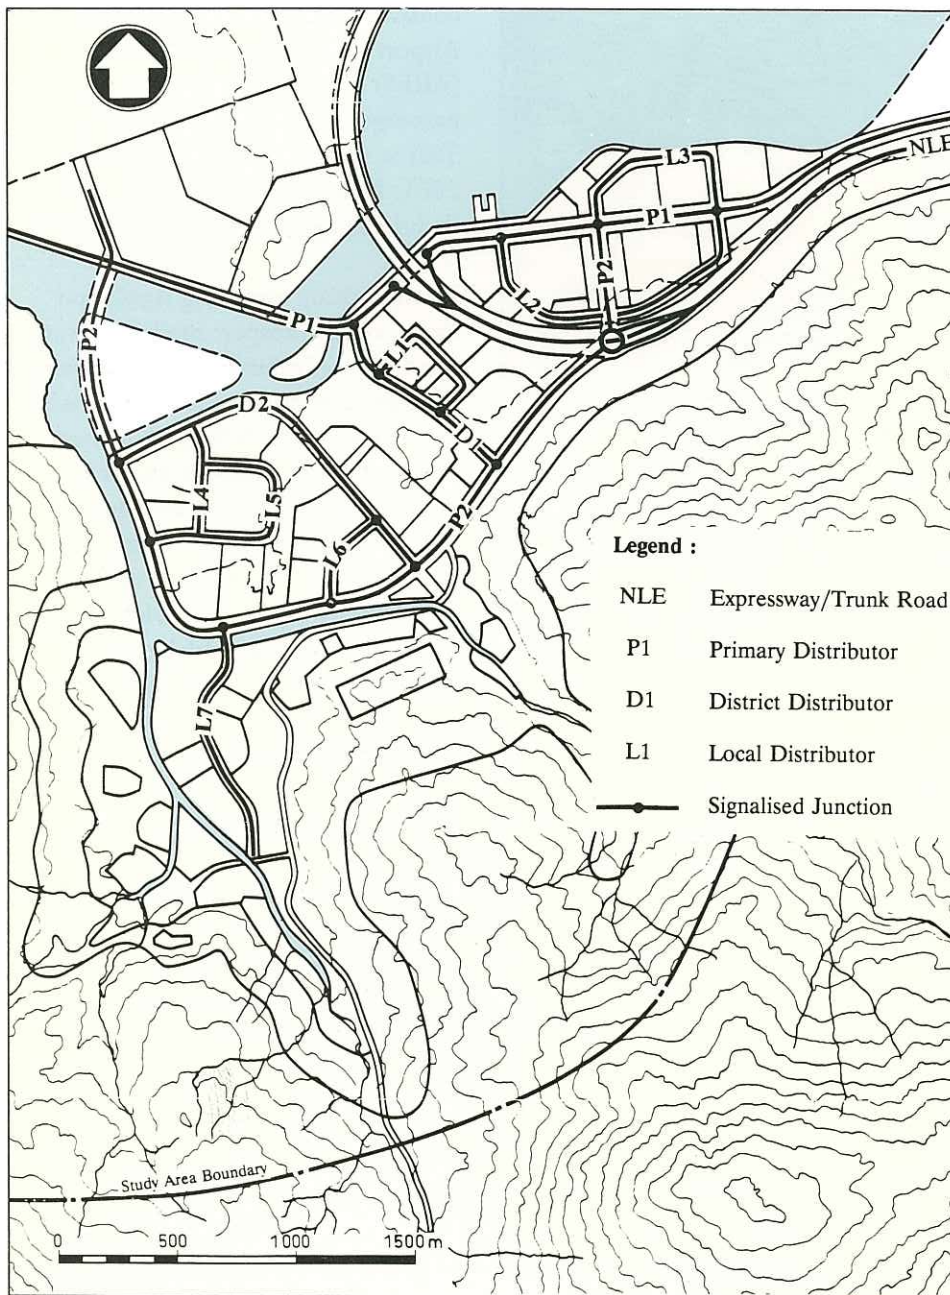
(a) Proposed Road Network for the New Town at Tung Chung Area
